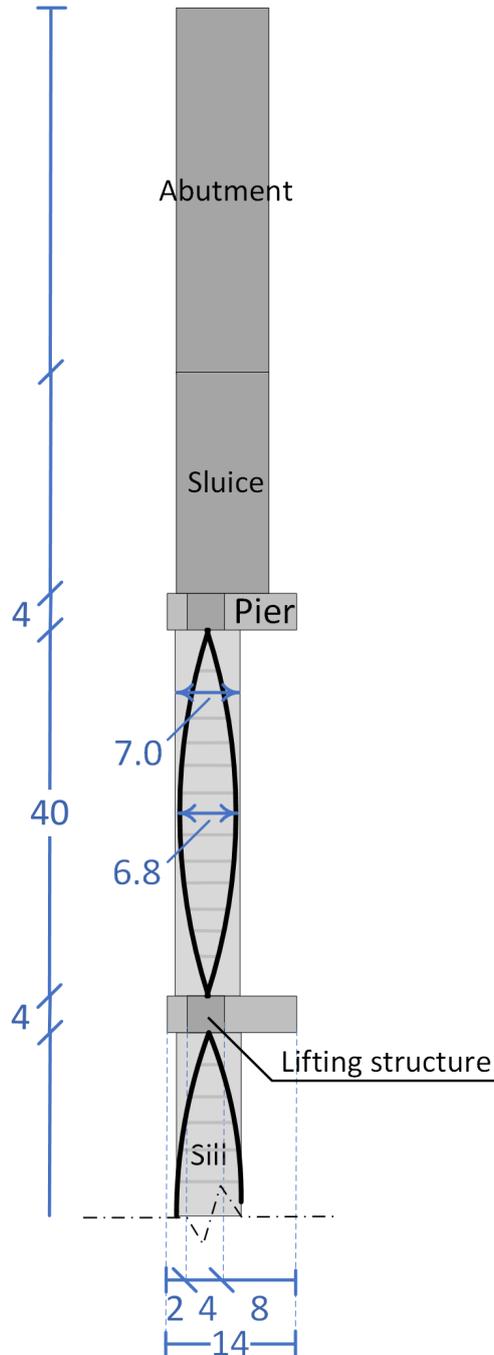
Top view of the storm surge barrier with a potential sluice and abutment for future plans with unknown dimensions
